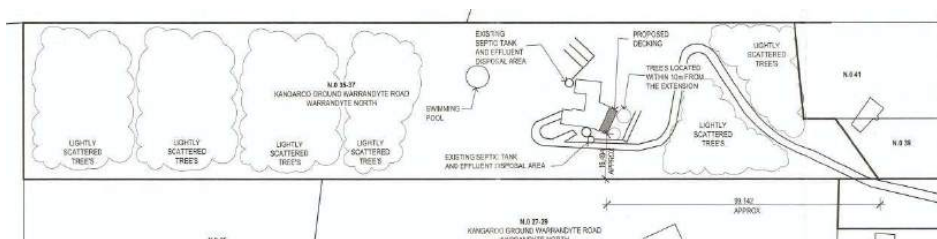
Site plan showing the new deck extension (in grey), dated 2014. Source: Nillumbik Building Plans.
